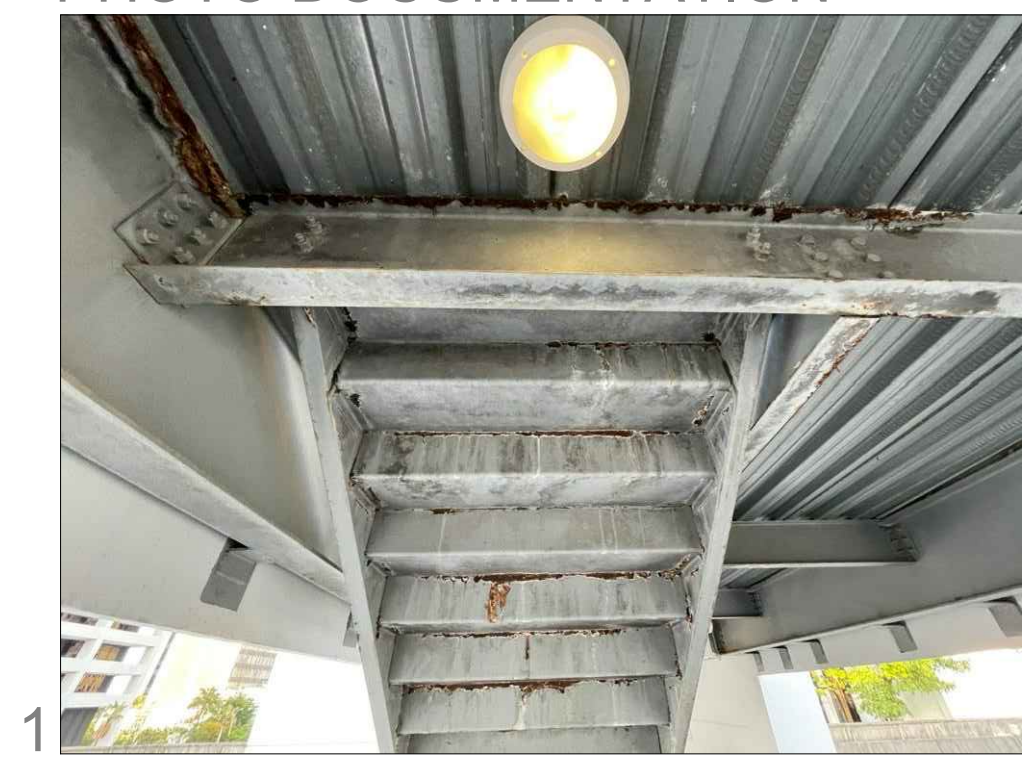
EXISTING DAMAGE BEAM AND CORRODED MEMBERS
